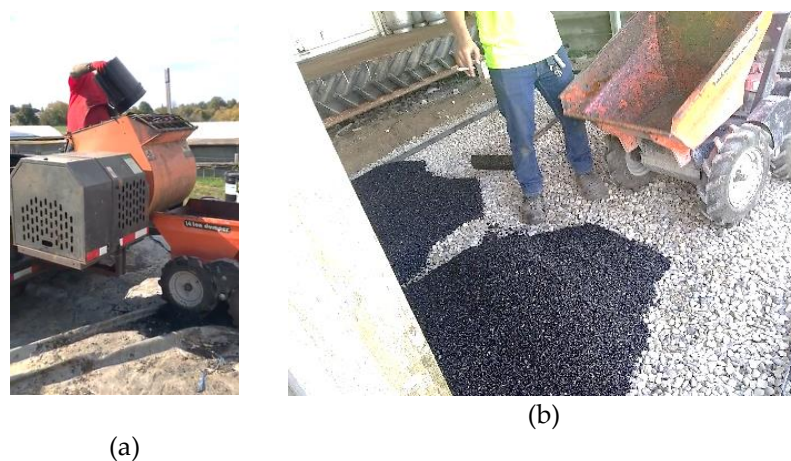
Construction equipment and placement of material; (a) Mixer, (b) Dumper
